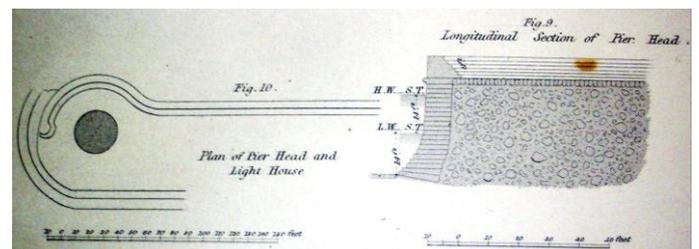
Rennie’s section and plan of the East pier, constructed with the diving-bell.
